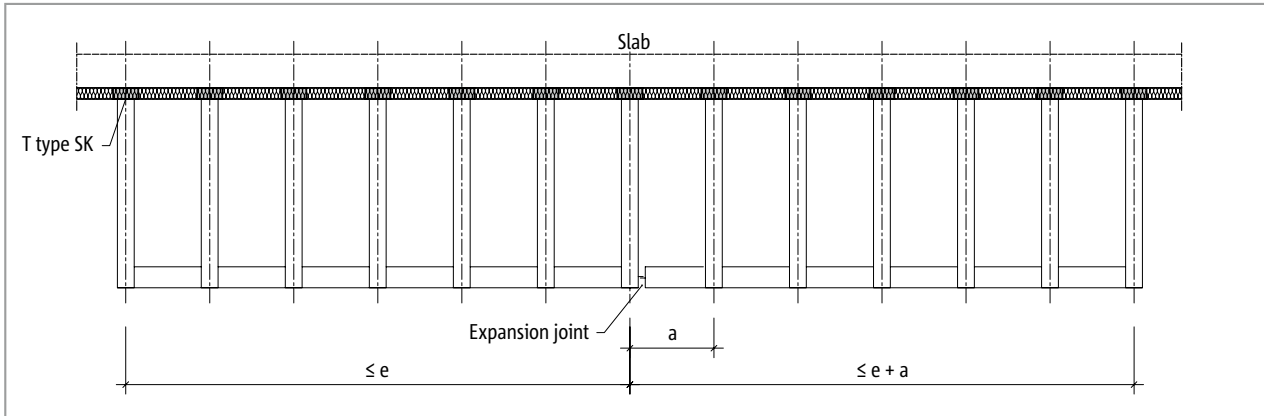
Schöck Isokorb® T type SK: Maximum expansion joint spacing  $e$
